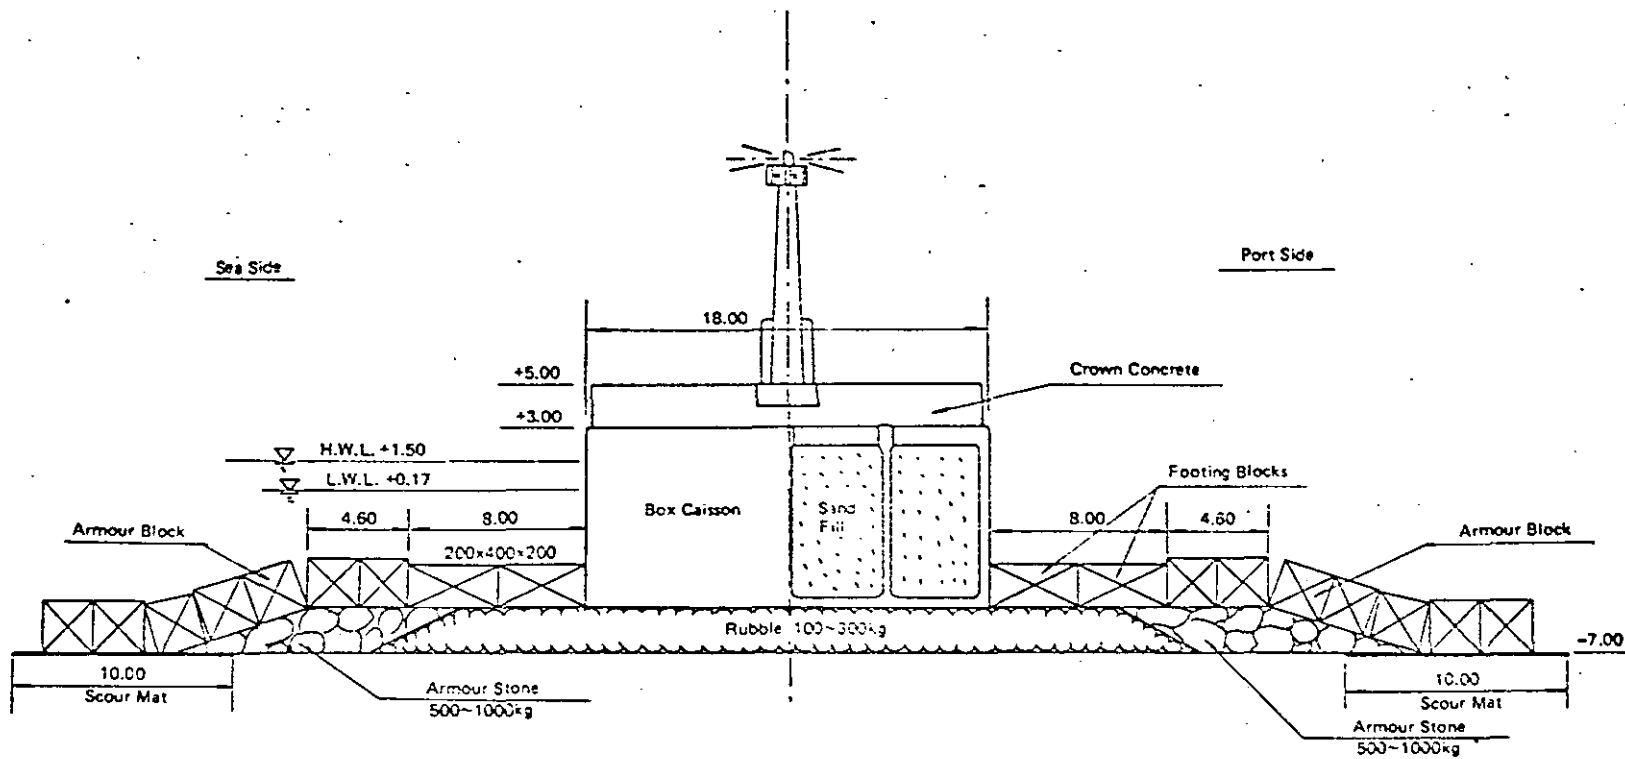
Example of Breakwater Head, Port of HACHINOE
